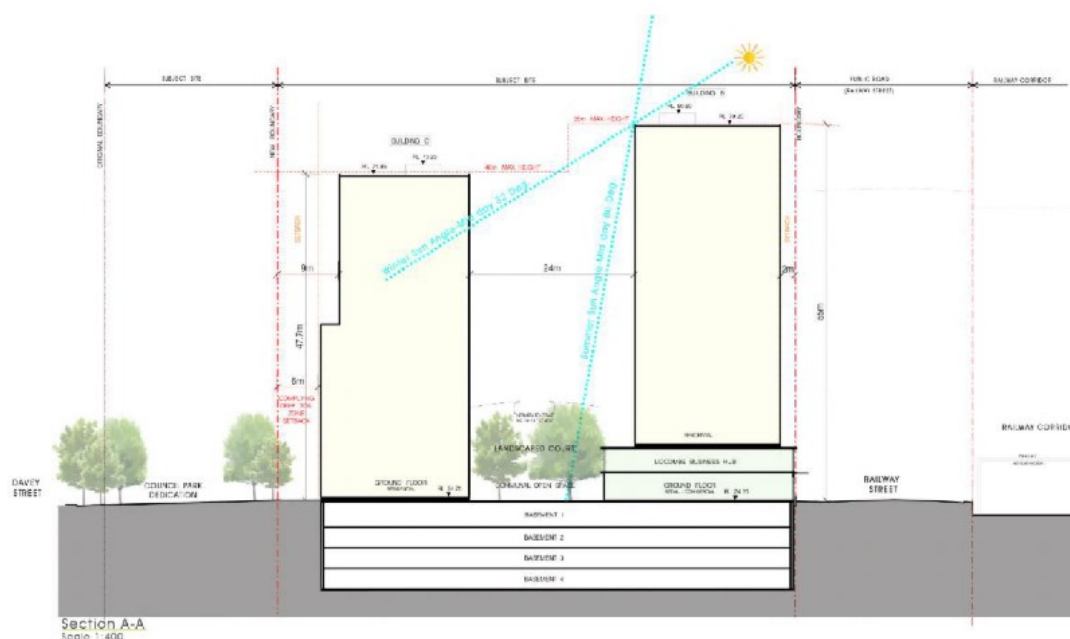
Section AA - 4-12 Railway Street, Lidcombe – Massing Study for Planning Proposal, prepared by Architecture and Building Works
